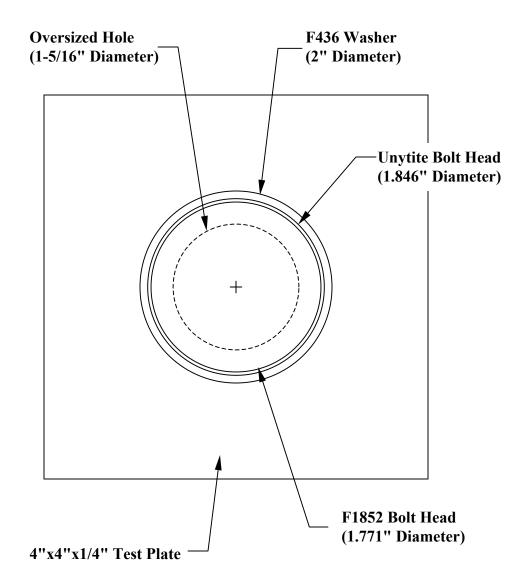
Bolt and Plate Layout for 1" Bolt in Oversized Hole (Drawn to Scale)
